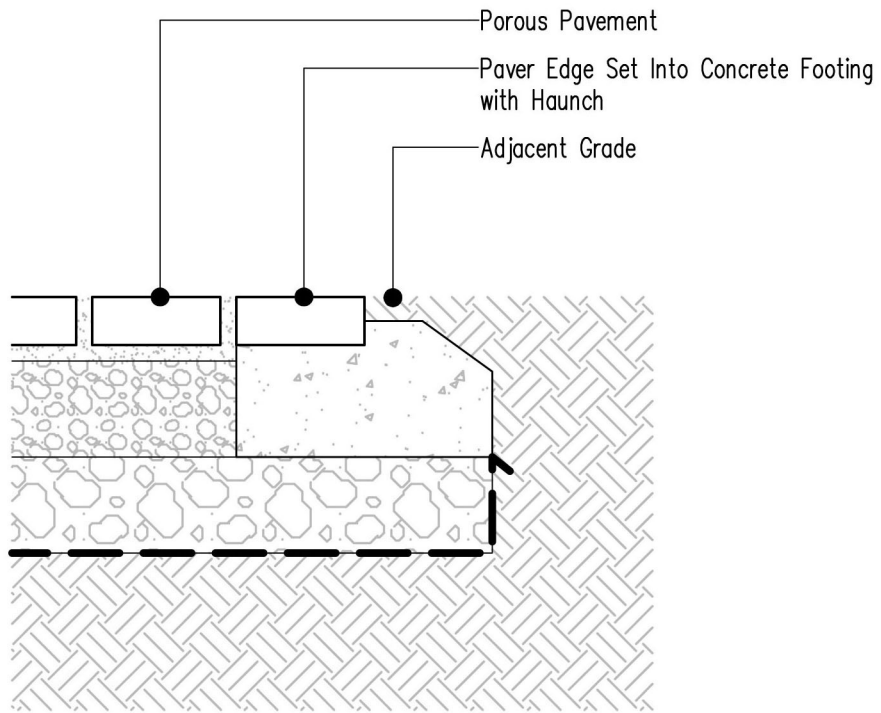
Porous Pavement Detail (without retention storage volume)
